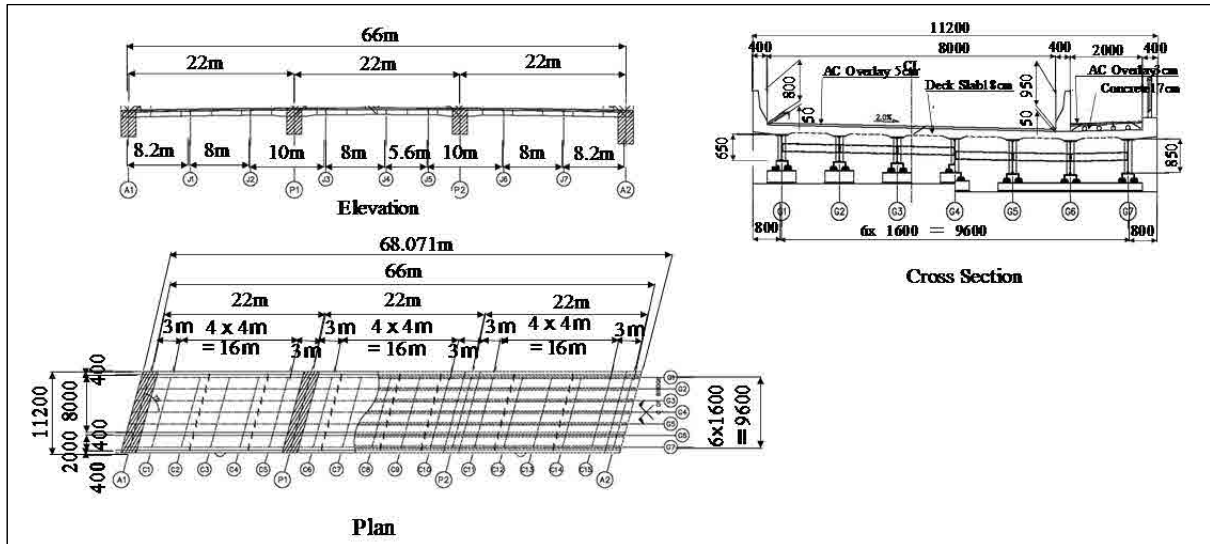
Outline of New Mataniko Bridge Structure
